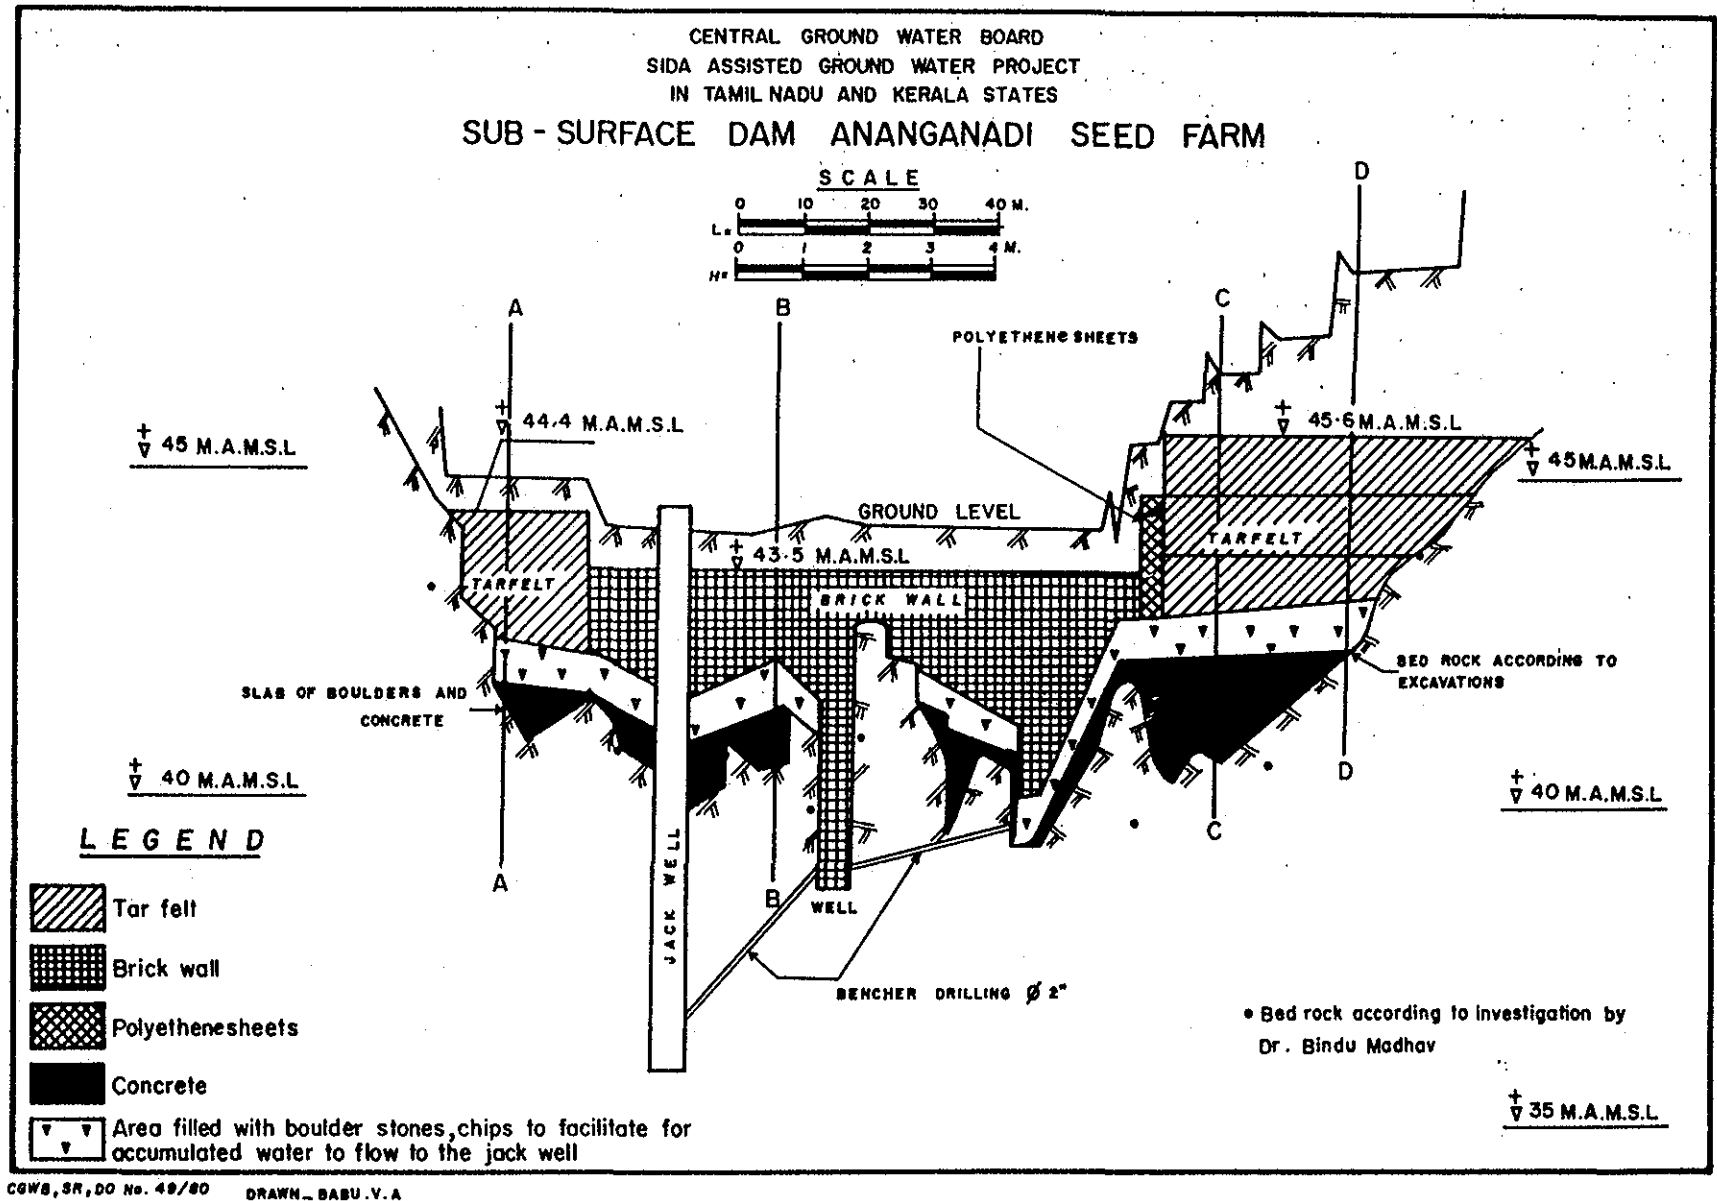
CONSTRUCTION PLAN OF A SUBSURFACE DAM IN INDIA.
